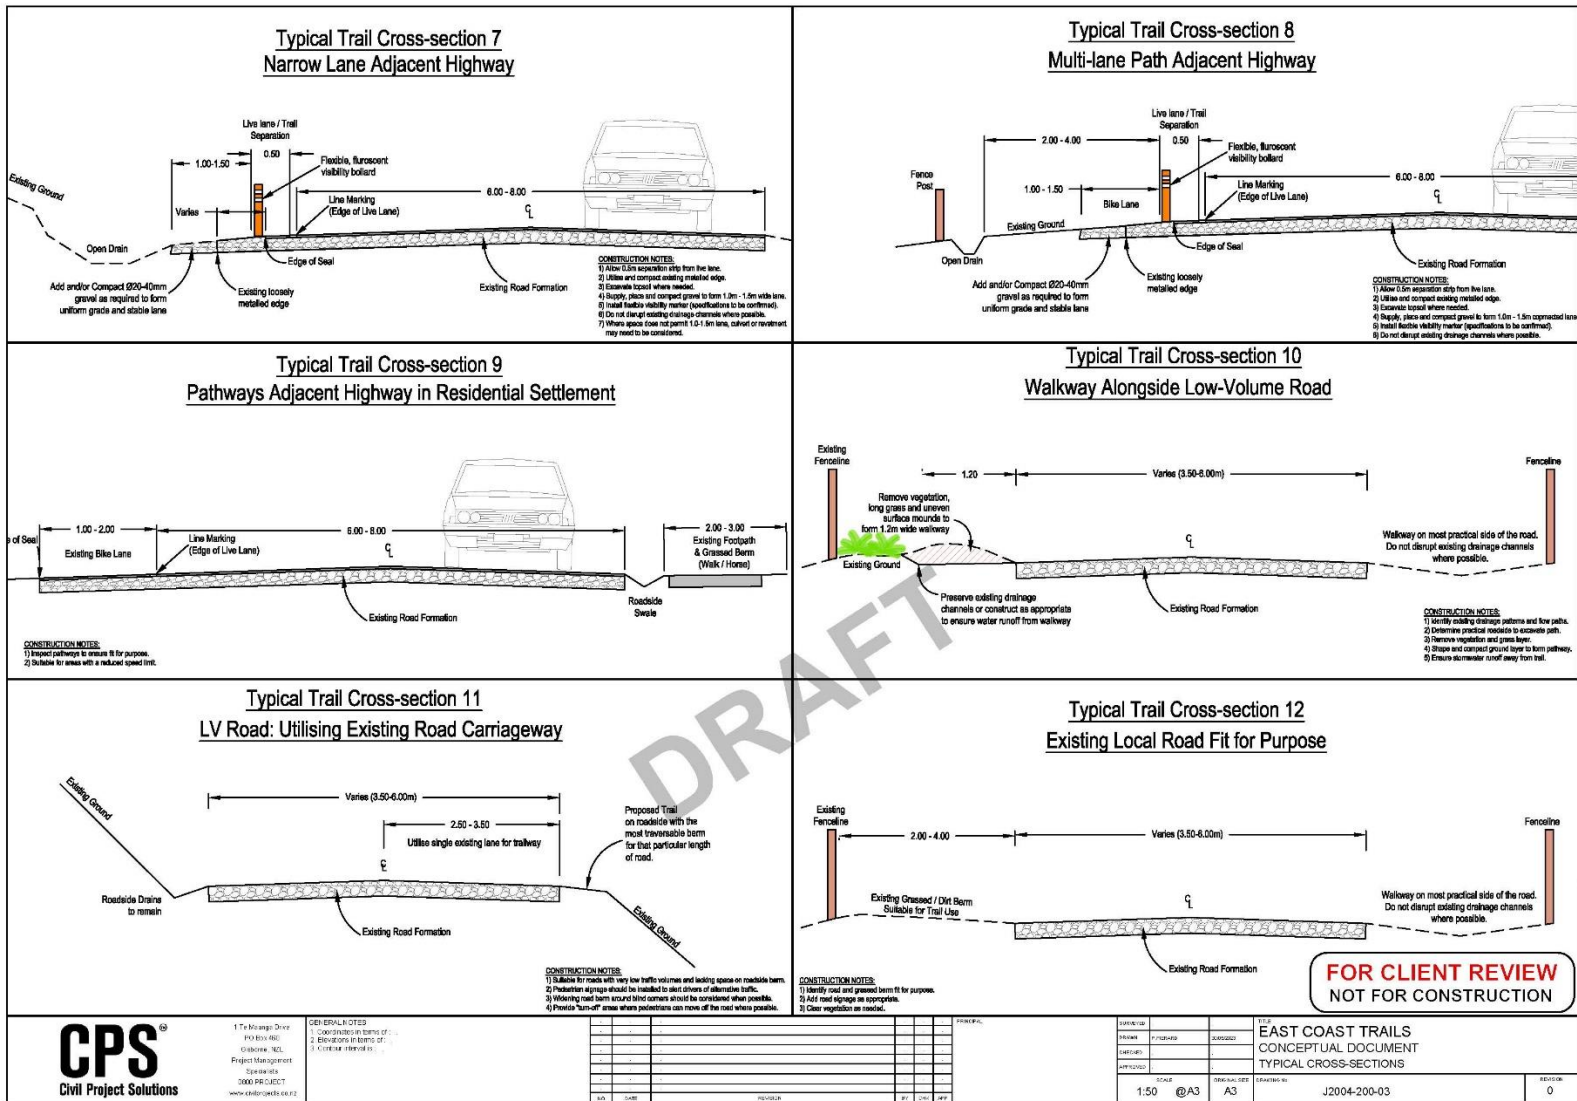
Concept drawings of the proposed trail tier constructions (Source: Civil Project Solutions).
